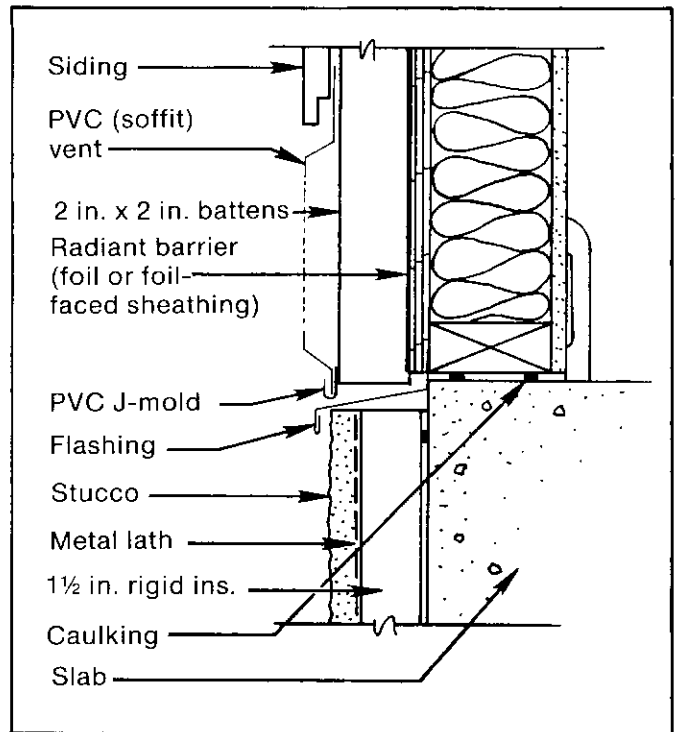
Detail of Bottom Inlet Vent-Skin Stud Wall With Radiant Barrier
